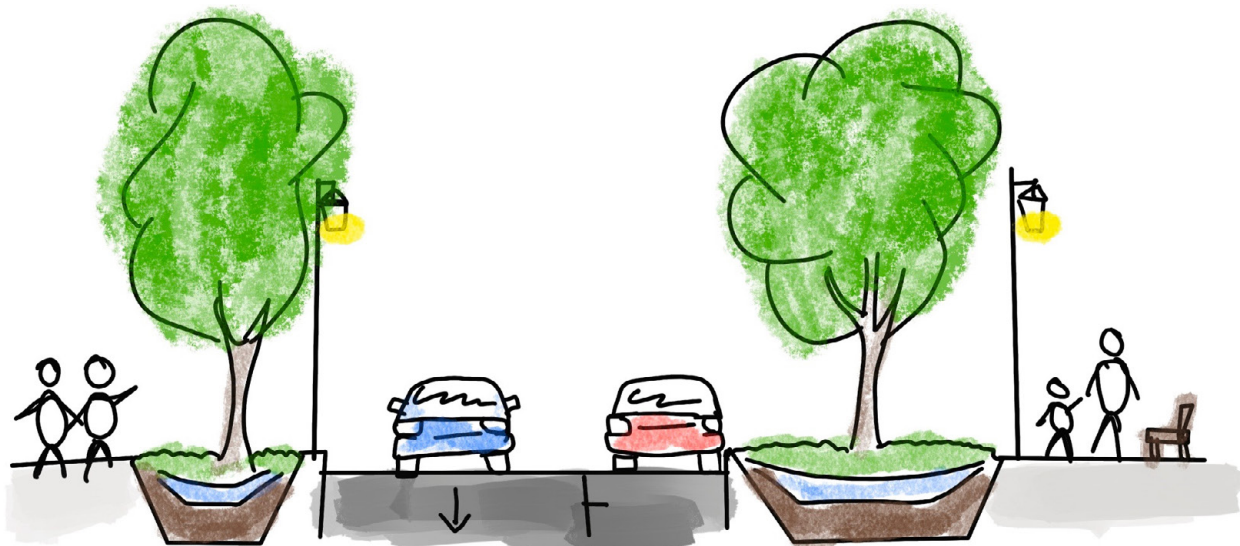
Conceptual cross section of a green street including narrow right-of-way and bioswales.
